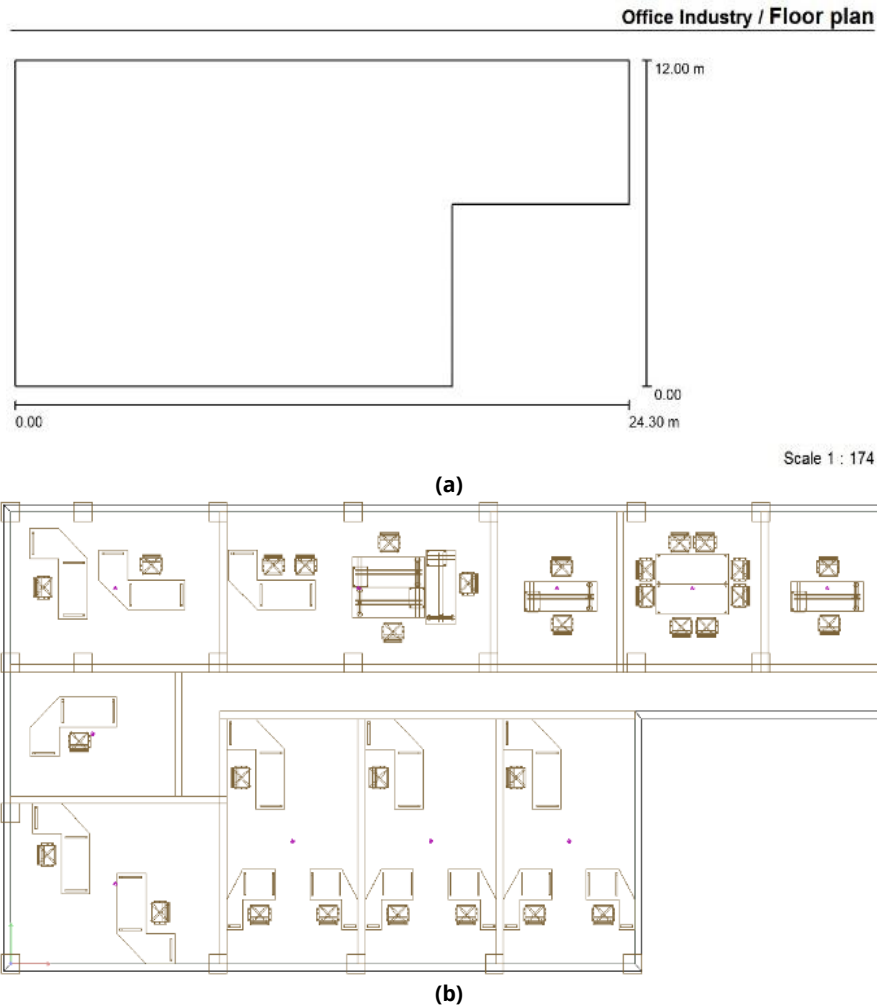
Layout plan for industrial office simulation, a). Floor plan, b). Layout plan.
